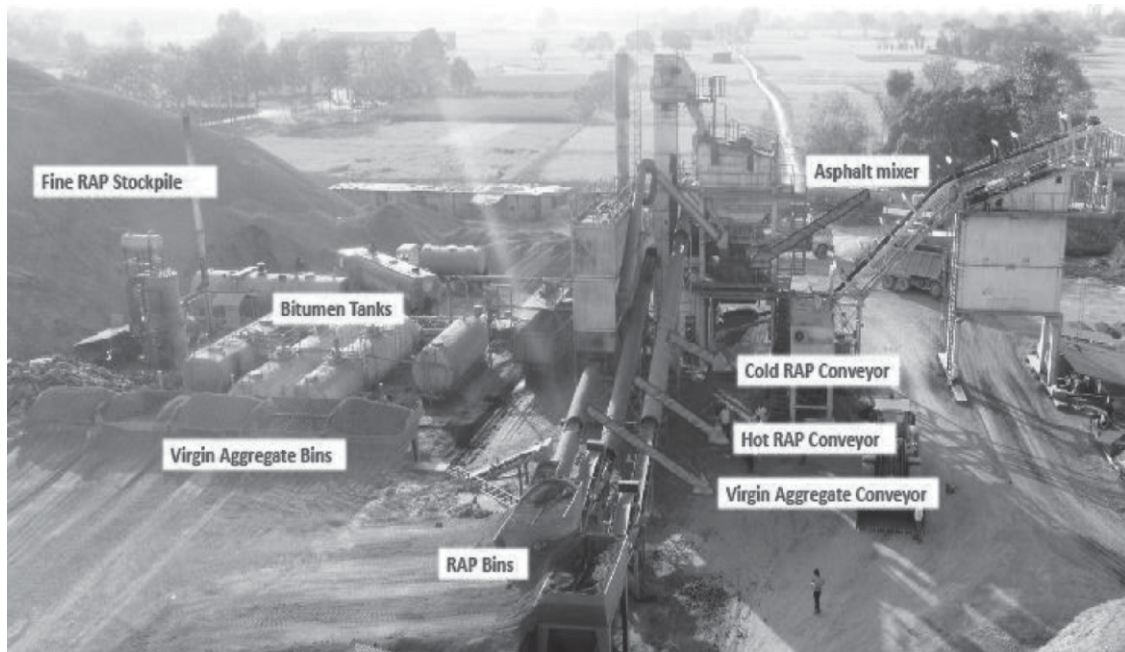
Marini Batch type Hot Mix Recycling Plant with Hot and Cold RAP
